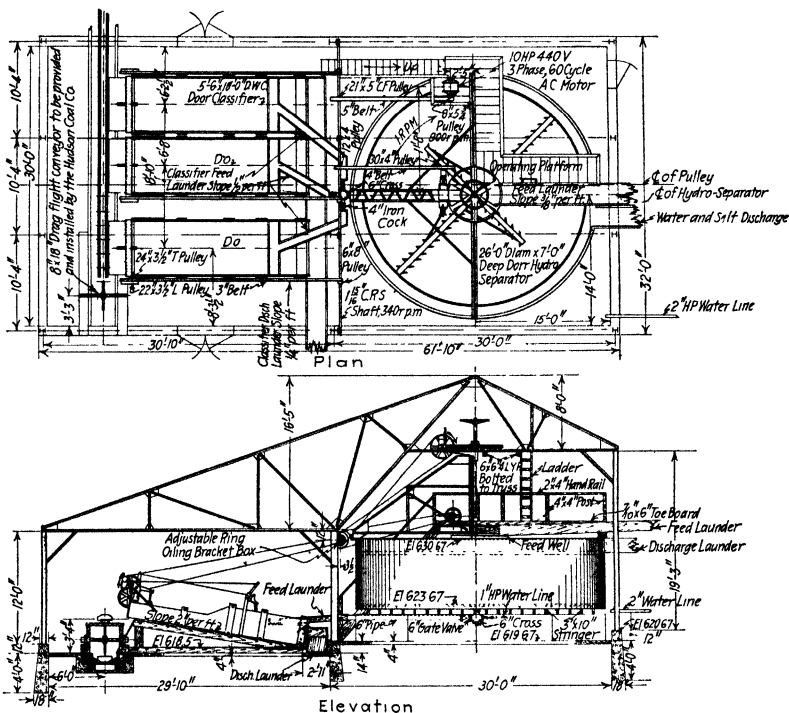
PLAN AND ELEVATION OF FINE-COAL RECOVERY PLANT.
